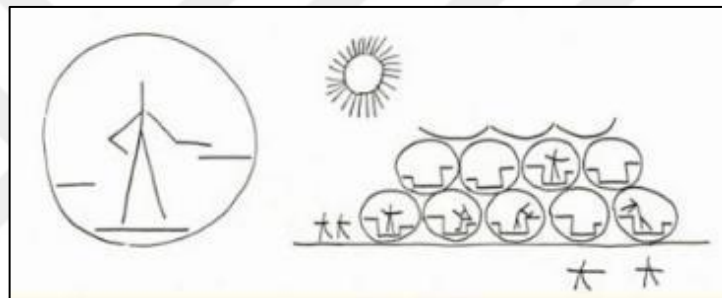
Section sketch of Cylindrical Shelters [125].
